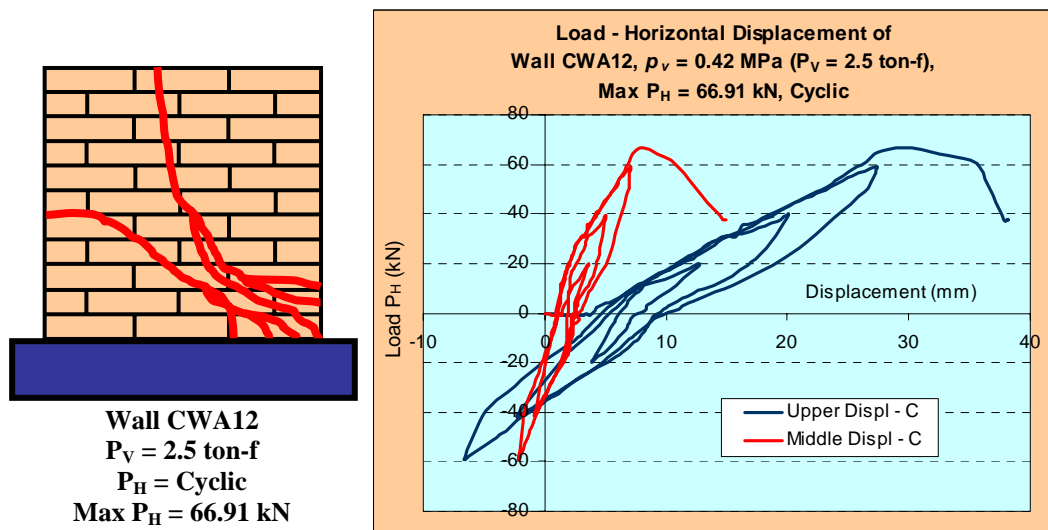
Failure pattern and load-displacement of wall CWA12
